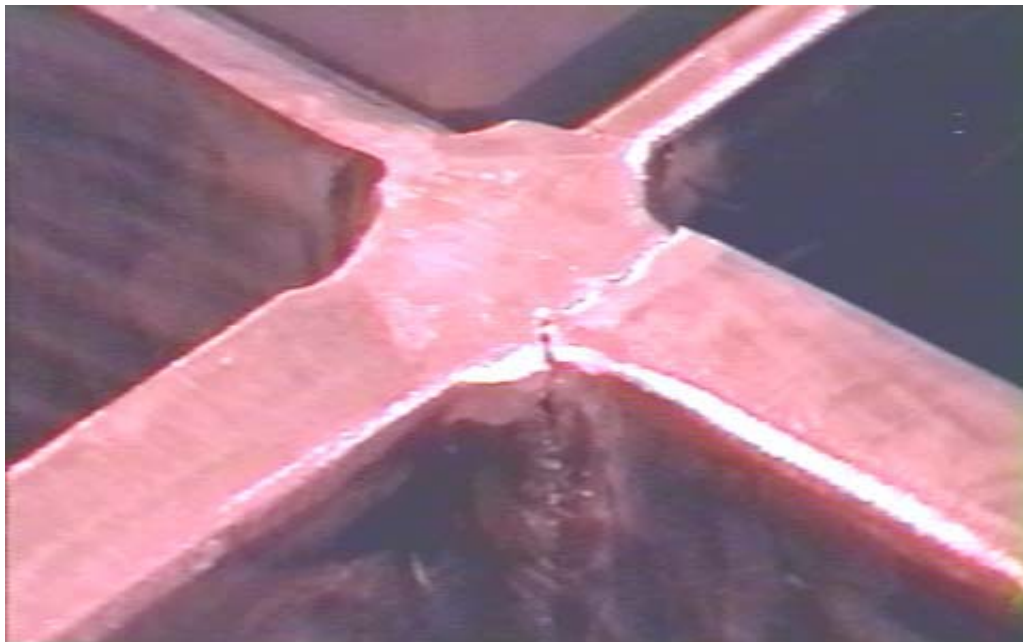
Same as Figure B-17 with complete view of existing weld crack 4 identified in Figure B-19.
